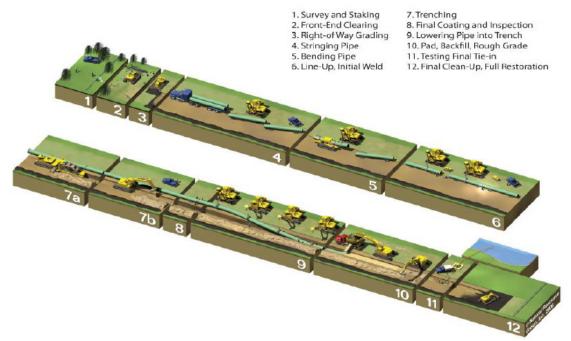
Typical site preparation and construction of gas pipeline infrastructure (Ephraim, 2017).
